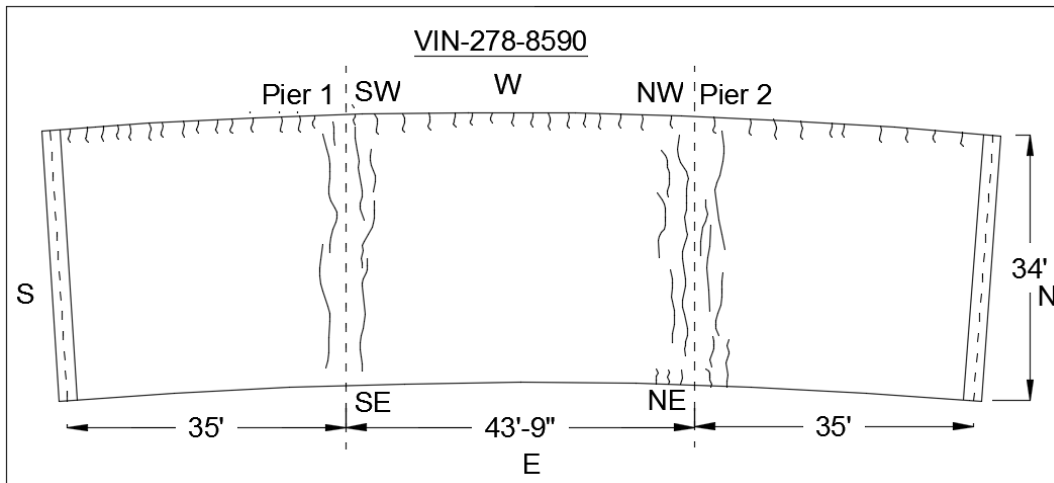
Bridge Inspection Pictures and Crack Map – VIN-278-8590
